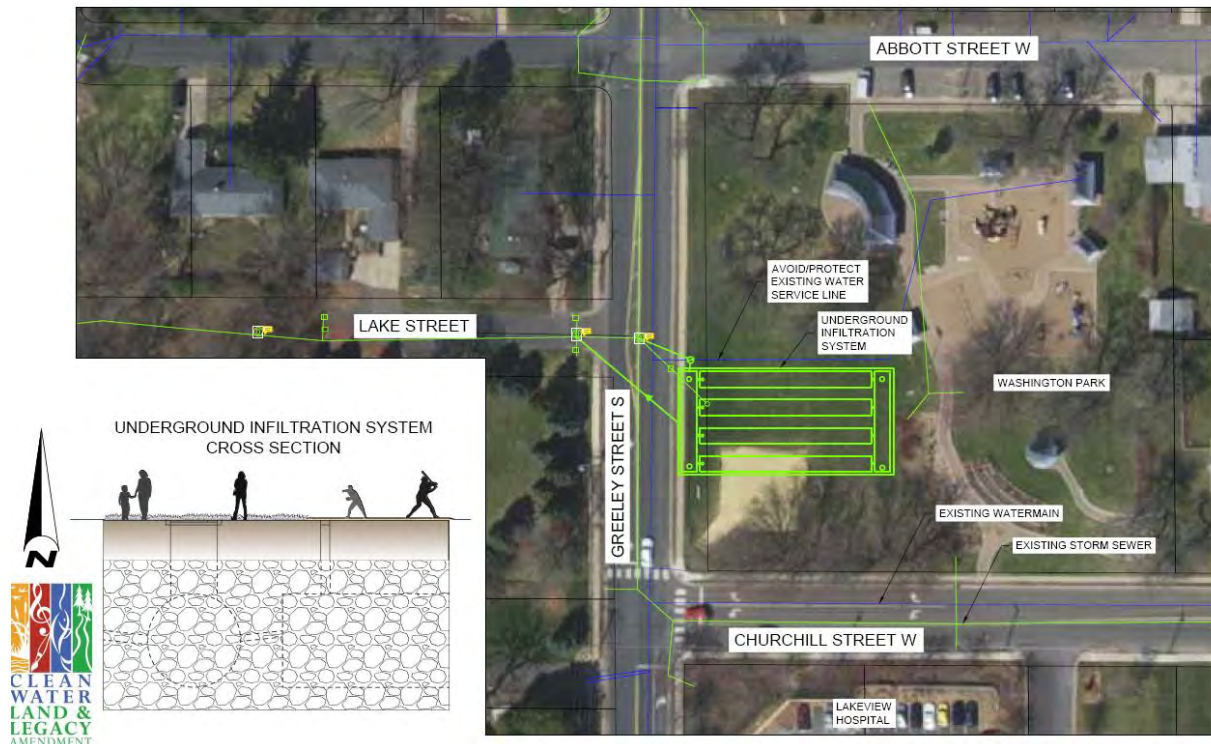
Washington Park Infiltration Gallery overview used for public engagement.
